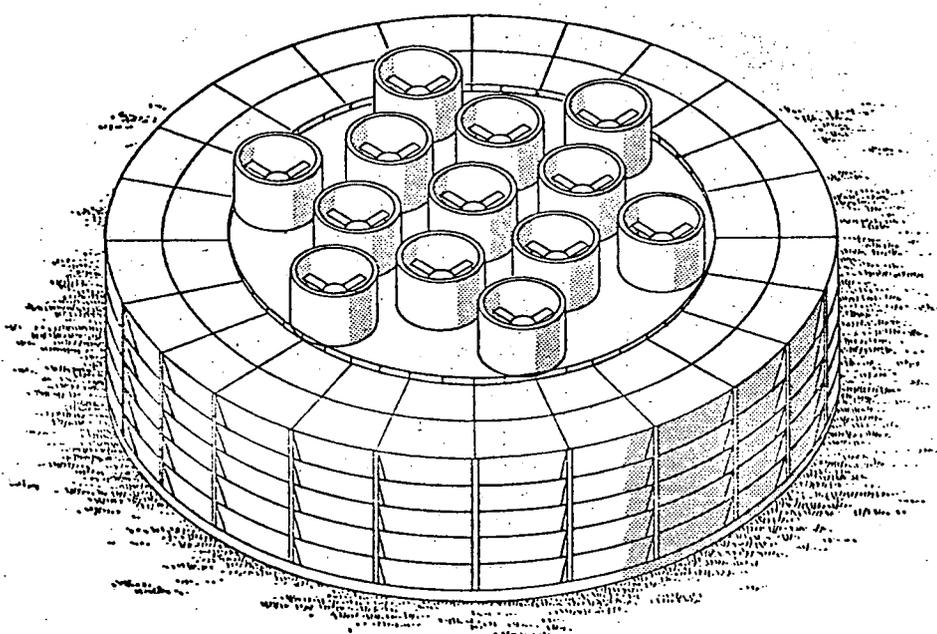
Conceptual sketch of circular mechanical-draft cooling tower. (The tower is about 270 ft in diameter and 74 ft high.)
